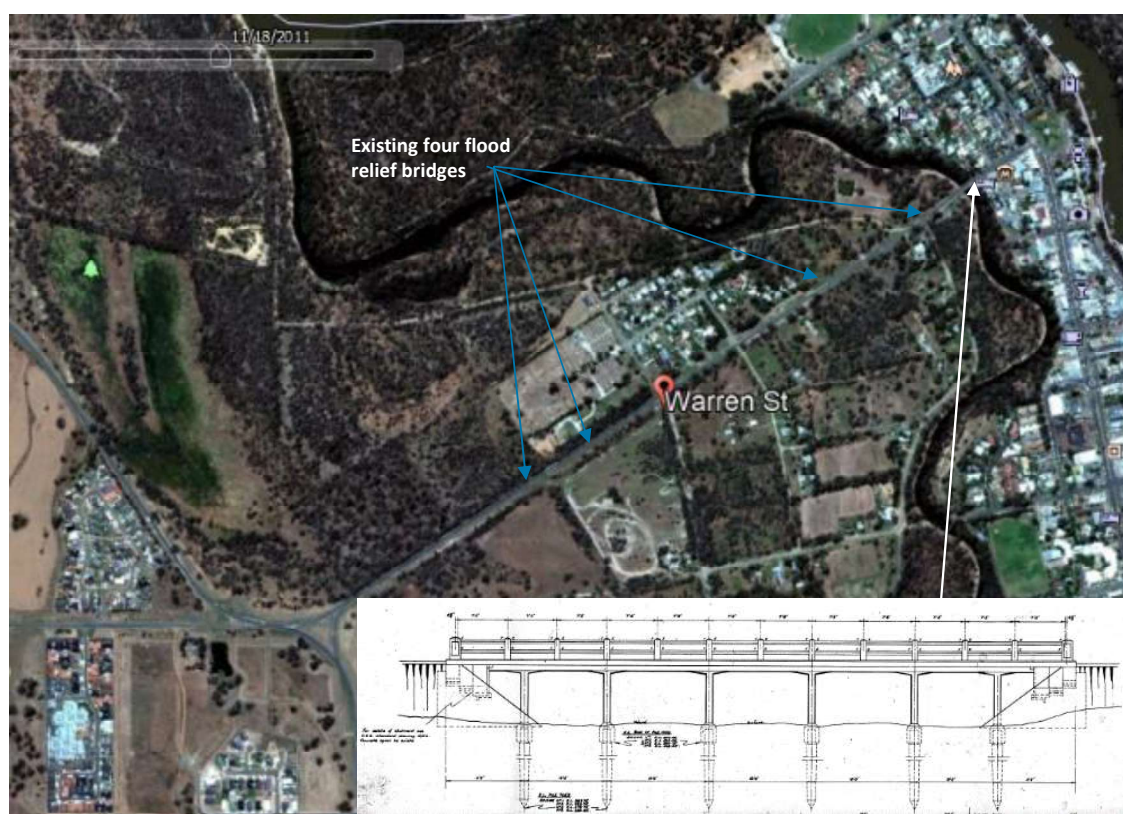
WARREN STREET BRIDGE ON CAMPASPE RIVER (BEFORE UPGRADE)
